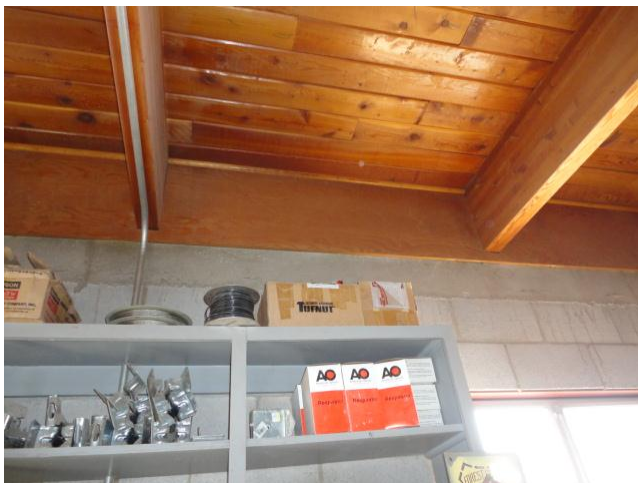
Install surface mounted conduits up CMU wall to just below wood beams, then along bottom edge of wood beams.
